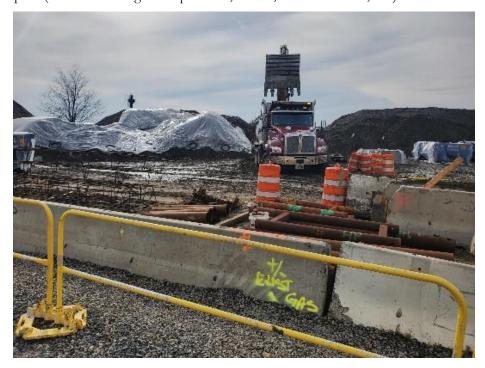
BUD and Cap material stockpiles south of 2.5 acre BUD area along western perimeter
